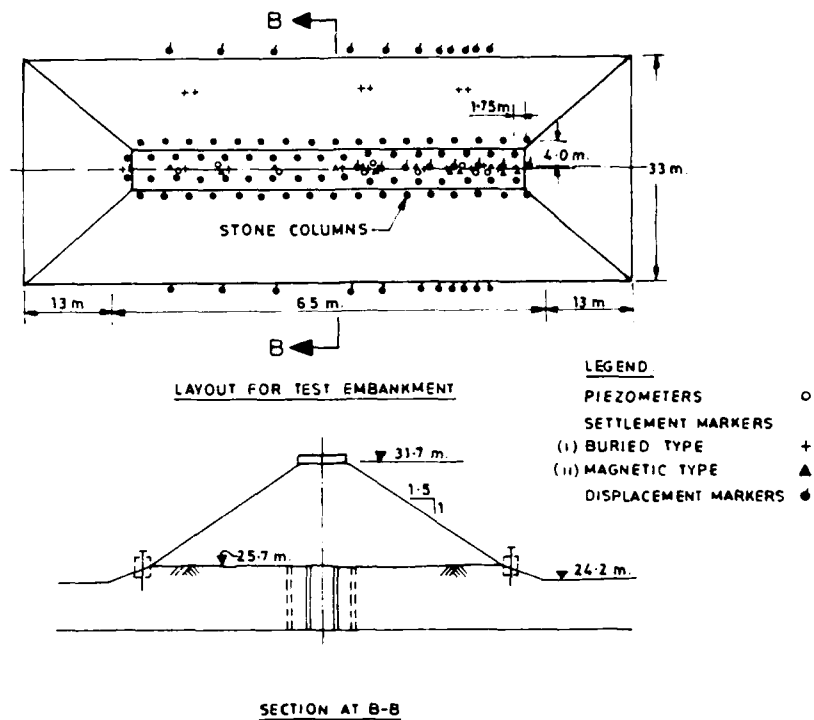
EMBANKMENT & INSTRUMENTATION DETAILS AT BHANDUP TEST PLOT
